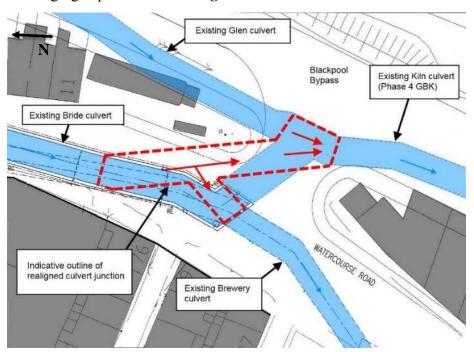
Realignment of Culvert Junction, Madden's Buildings
